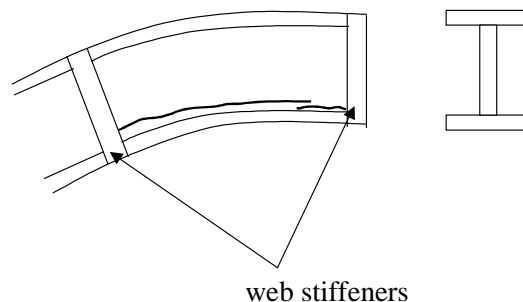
Schematic of arch apex with cracks. The crack length was about 4 m.
